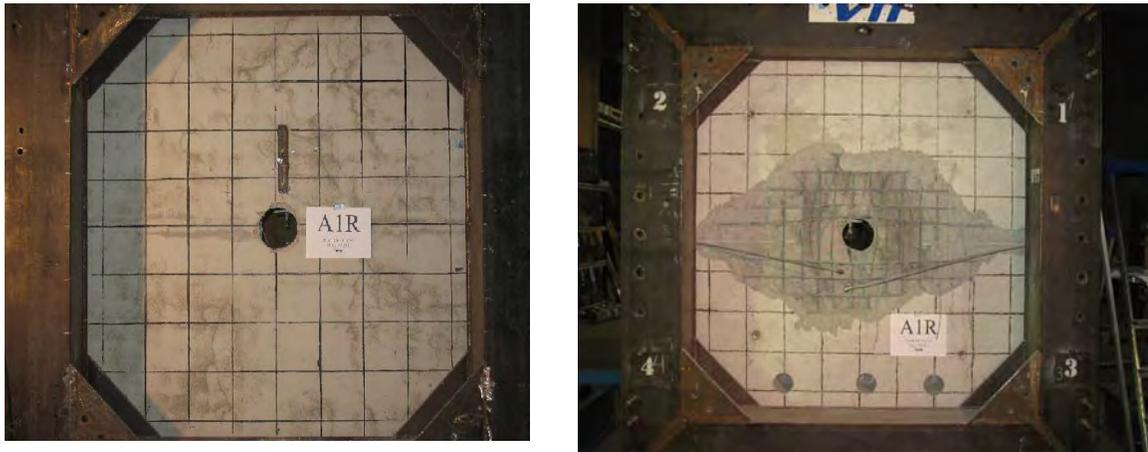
Front and rear side of the slab with longitudinal reinforcement only, after the test
